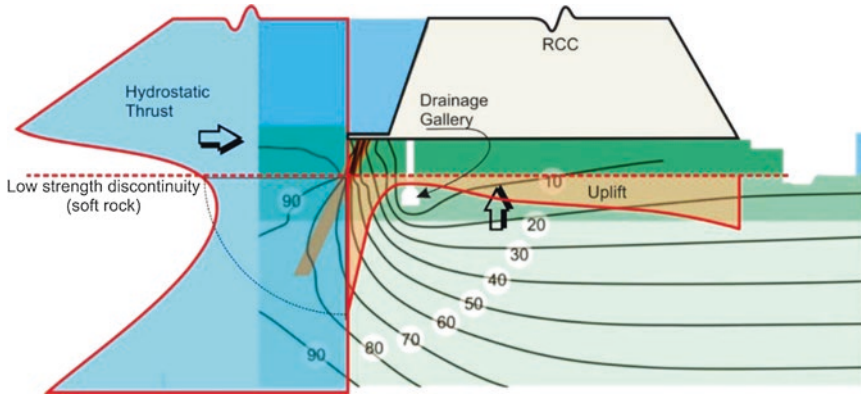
Hydrostatic thrust and uplift in a controlling surface below the foundation of a concrete dam. Actual case for Serra do Facão Power Plant (Brazil, 212 MW)
